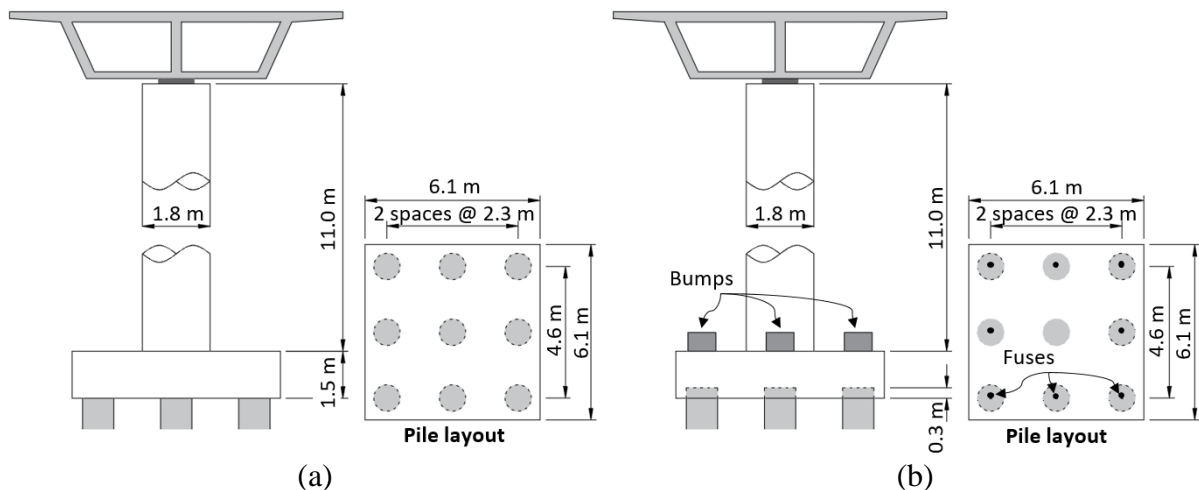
Key dimensions of (a) the PH pier and (b) the CRPF pier
